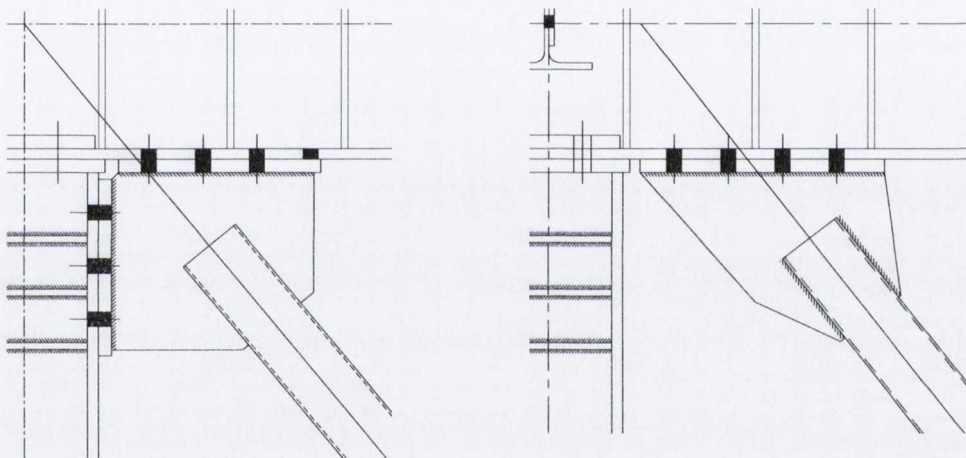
Common connection types showing (a) gusset joint with beam and column (CA) and (b) gusset joint with beam only (CB).
